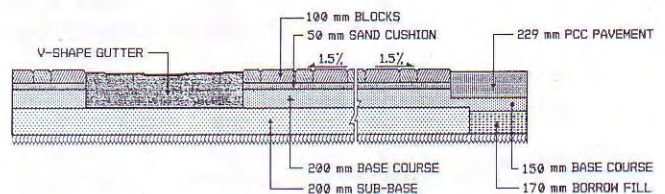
Concrete Blocks Abutting V-Shape Gutter & PCC Pavement
